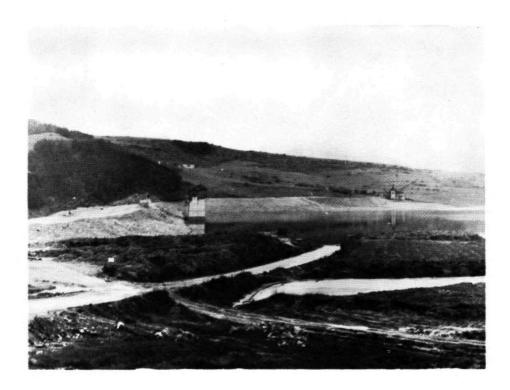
Construction of a stabilizing berm to stabilize the potential Mara slide
